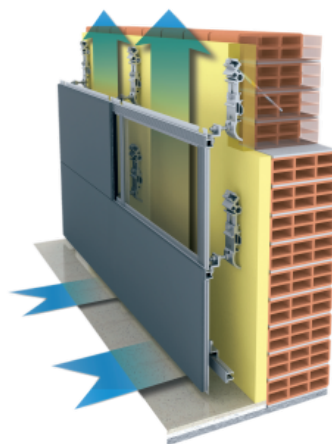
Wall cladding with ventilation corridor, L[14]
